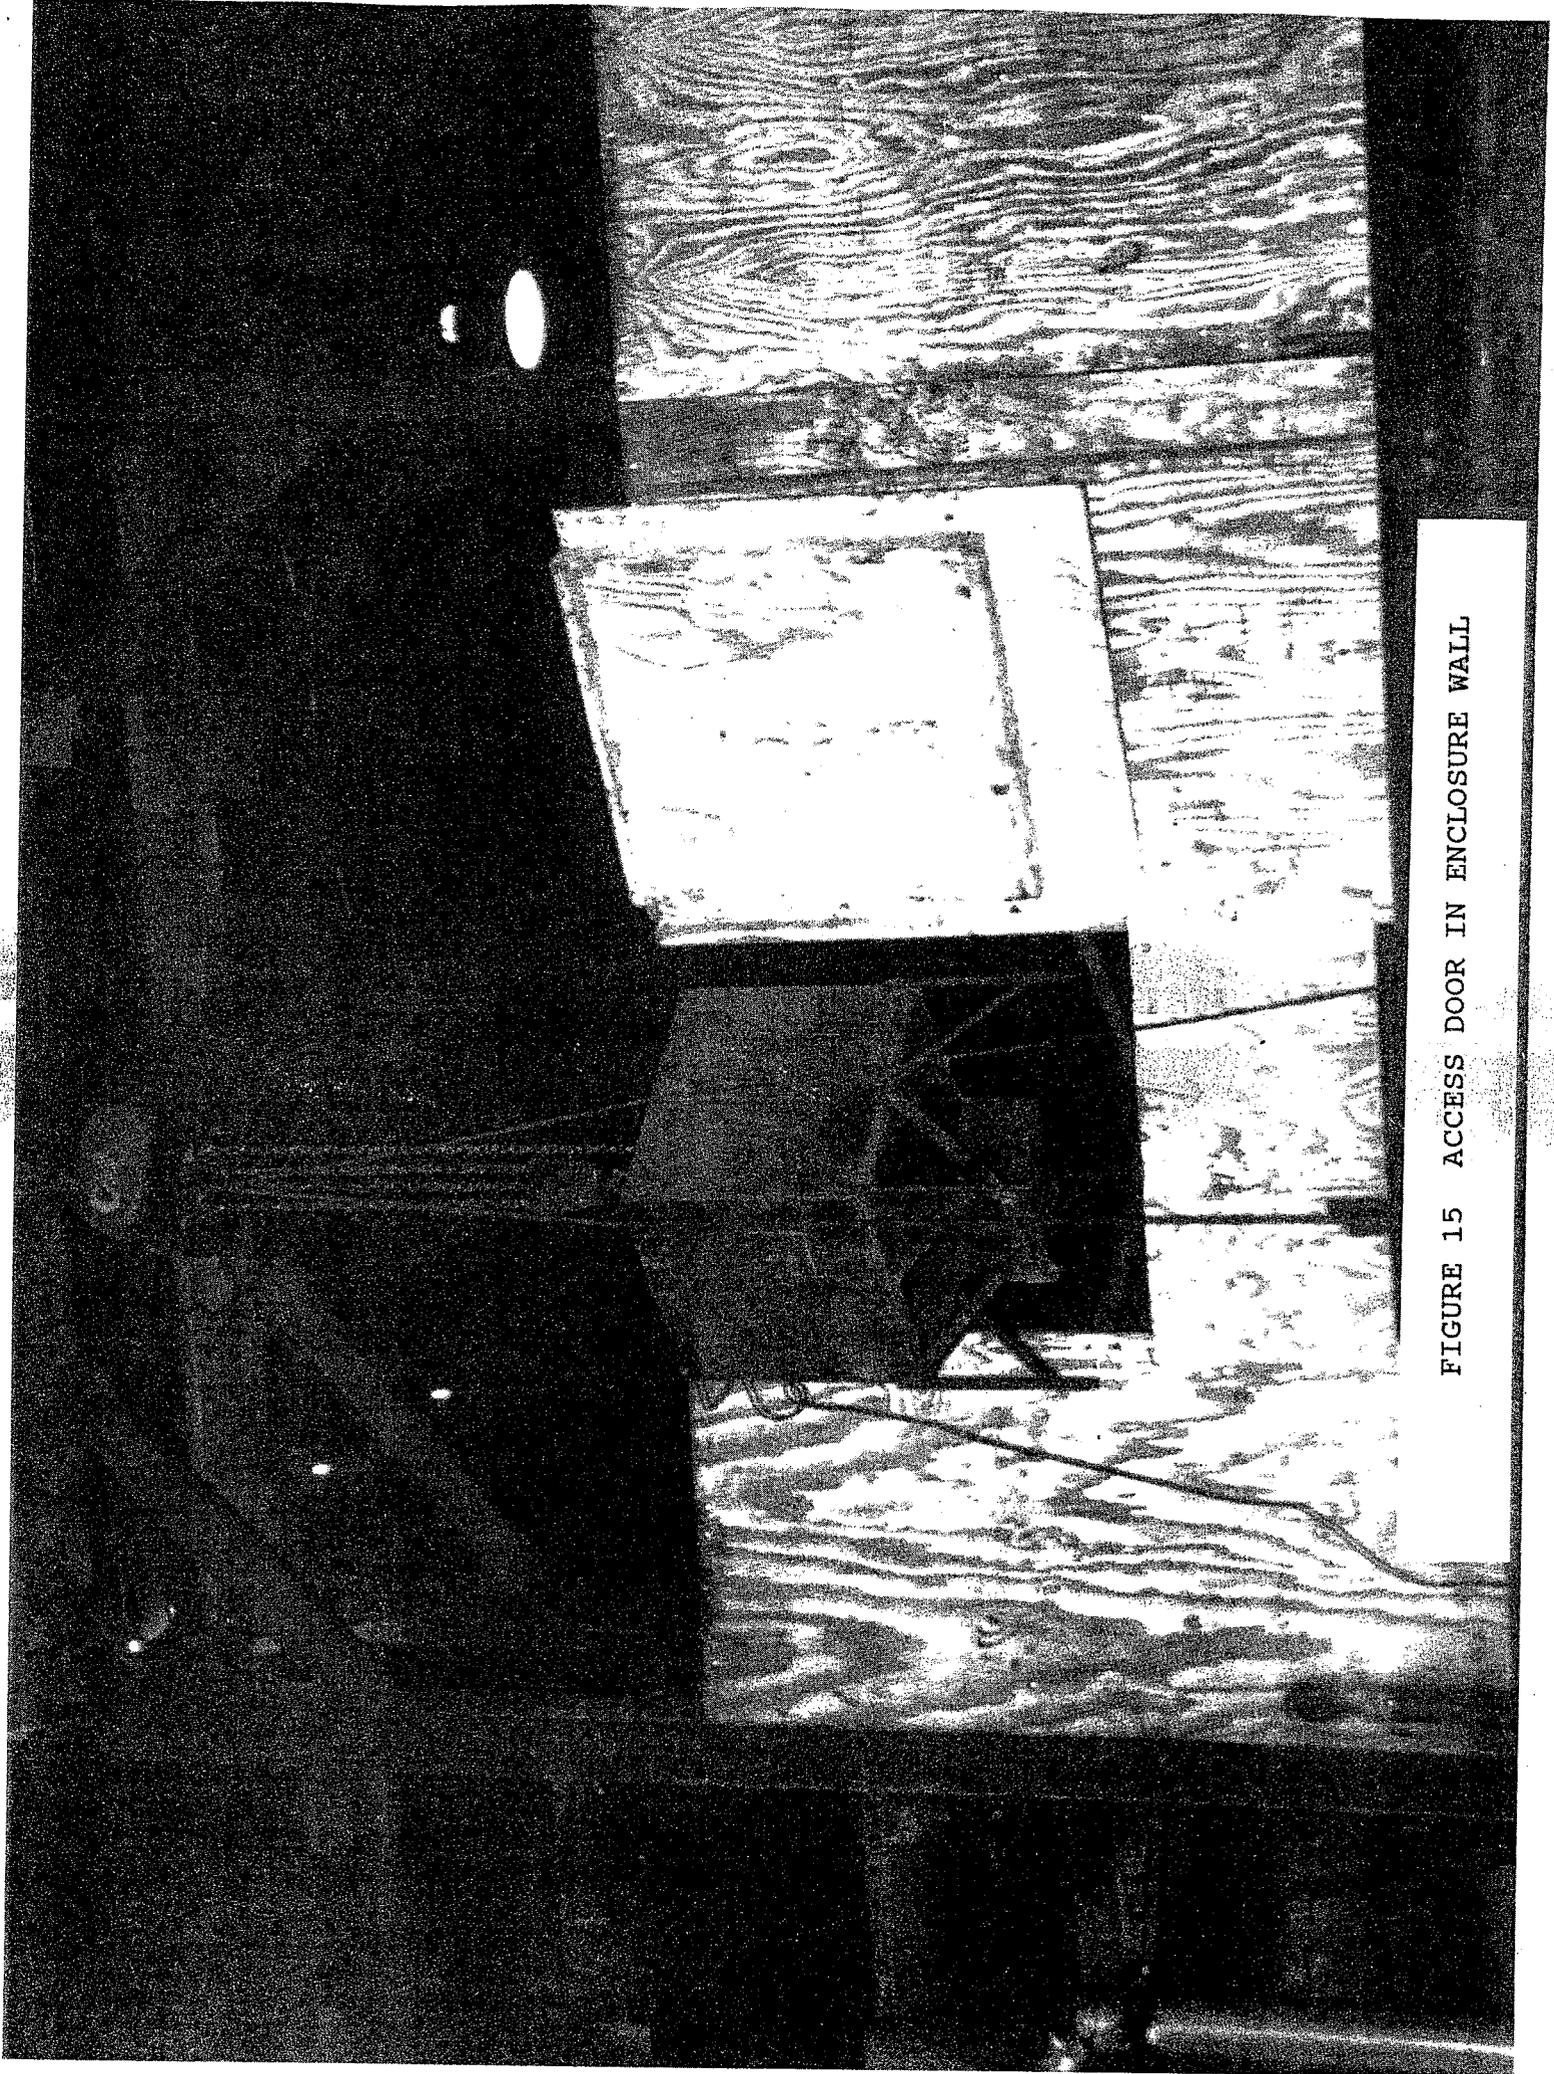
ACCESS DOOR IN ENCLOSURE WALL
